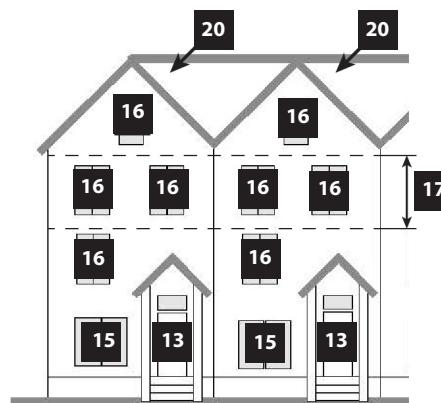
Row building street facade diagram shown with porch entry type and pitched roof type. Not to scale.
